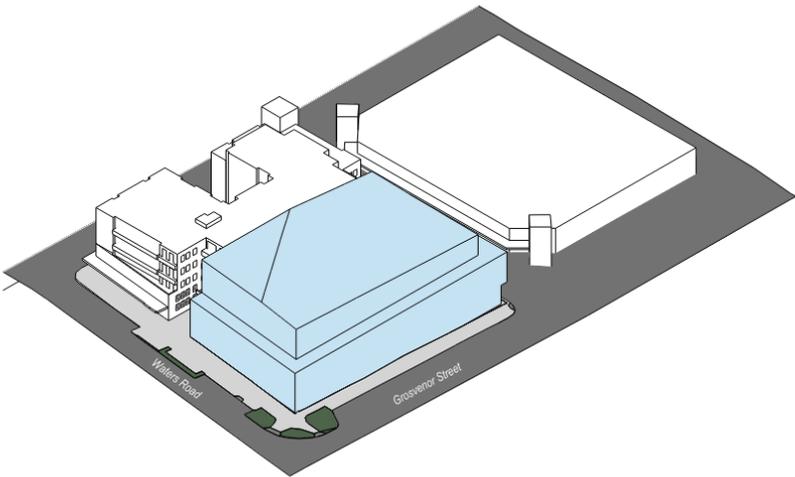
Permitted Building Envelope looking south-west (source: SJB Architects)
